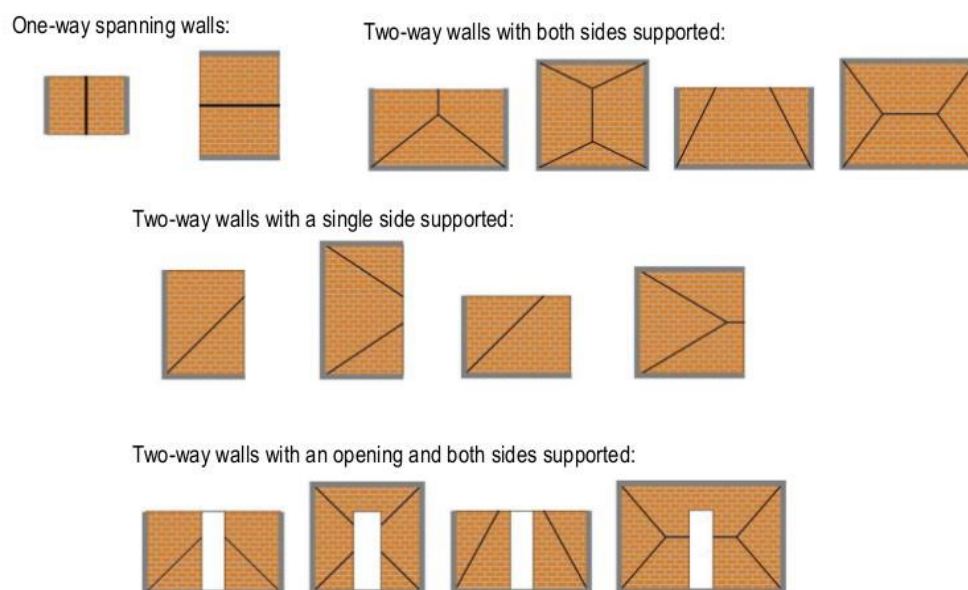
Failure of out-of-plane masonry walls from [43]
